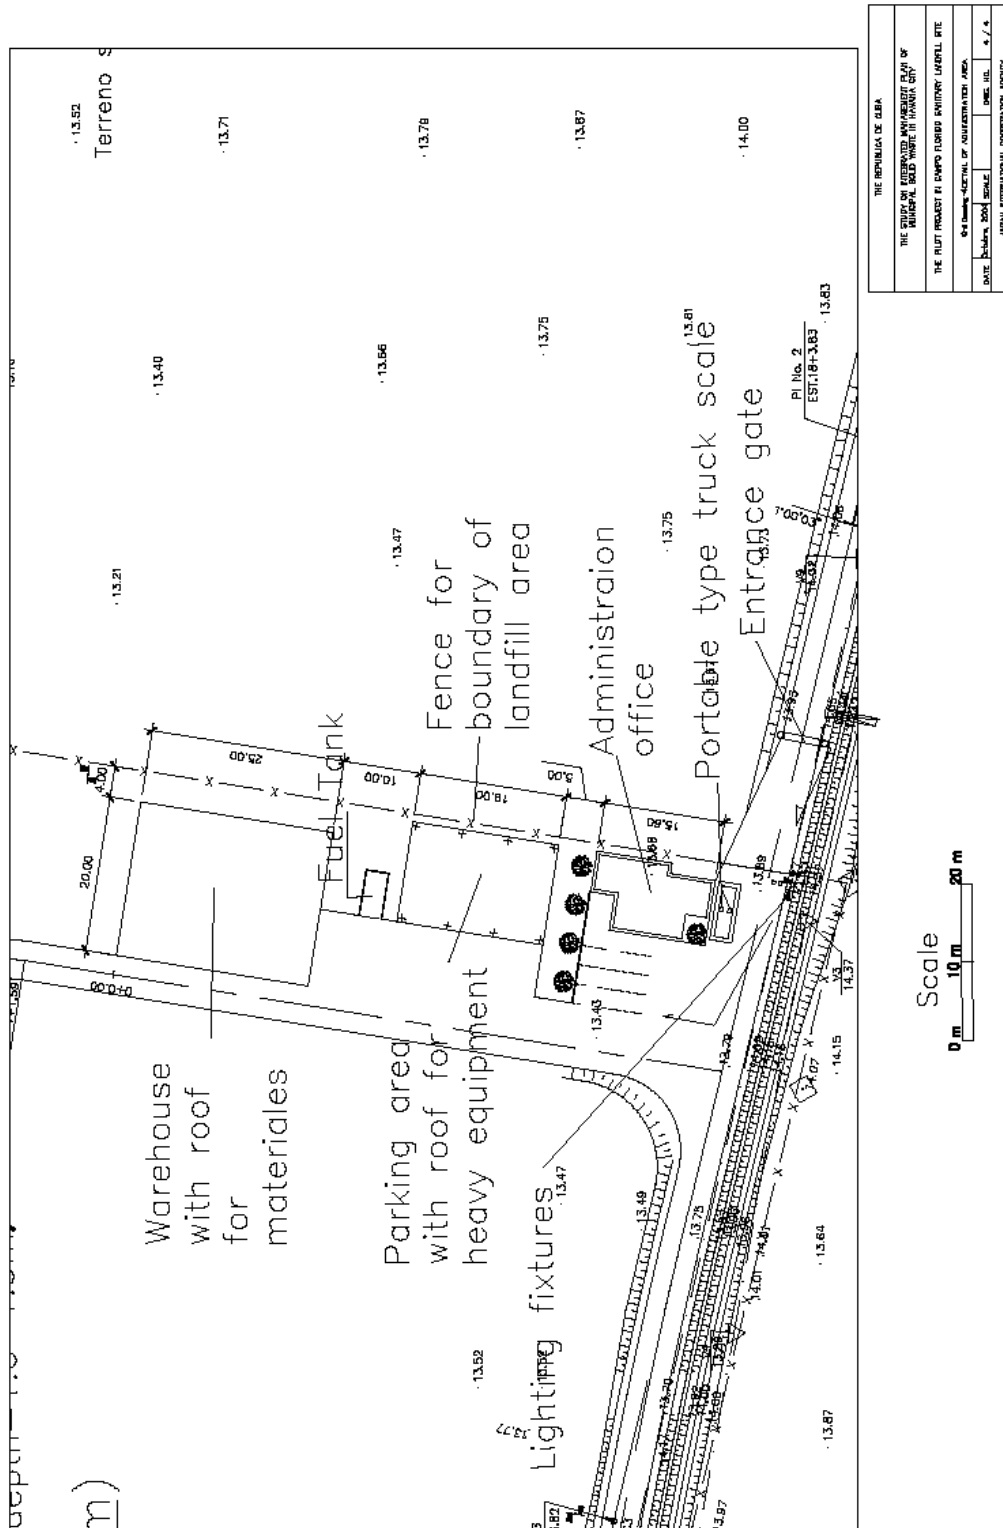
Site Plan of Administration Area in Campo Florida Landfill Site
